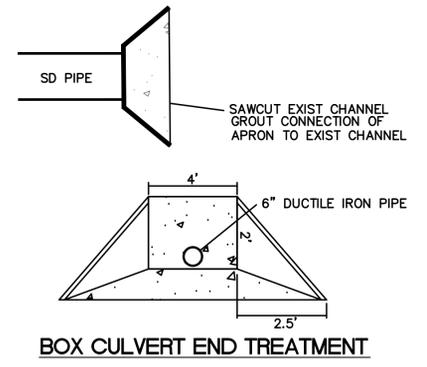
DETAIL D-D - ON-SITE STORM DRAIN SYSTEM
